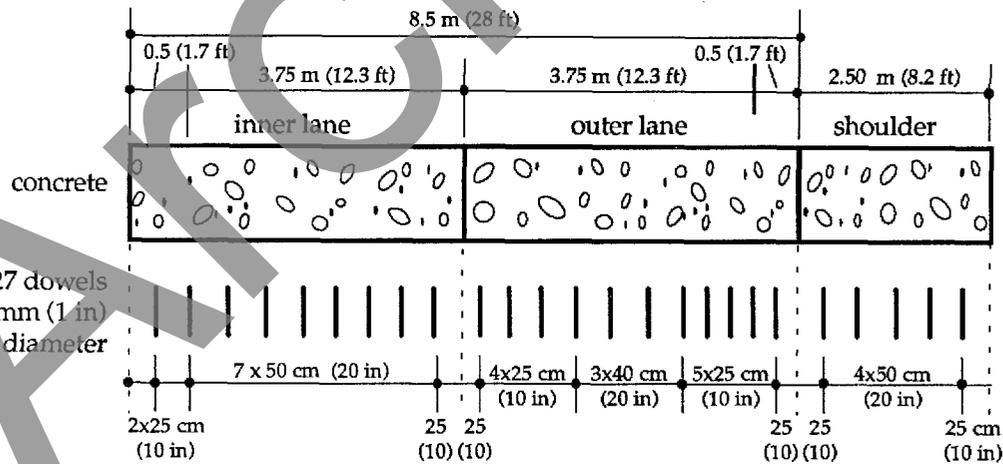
Varying dowel bar spacing across pavement in Germany. (See Figure 2.4.)
